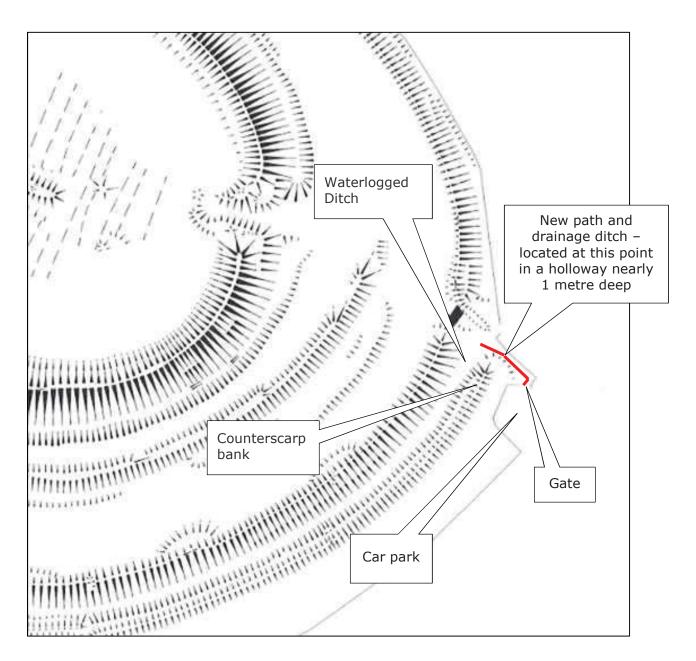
English Heritage plan showing, in red, the location of the path and drainage trench in more detail.
